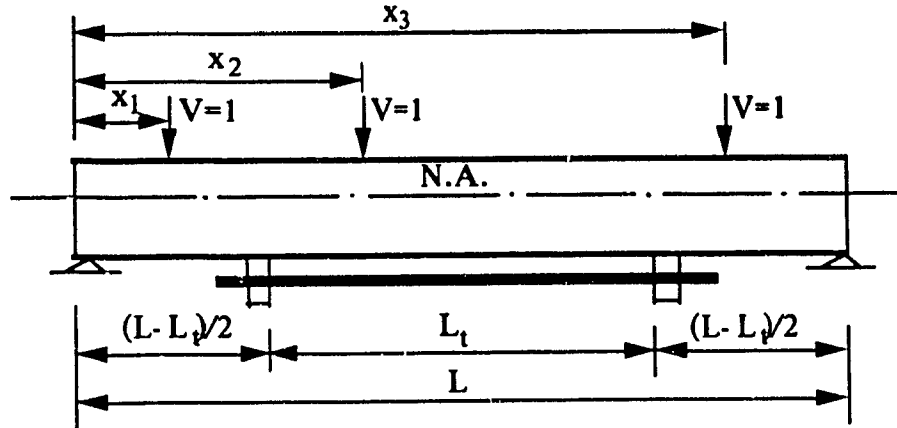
Typical girder prestressed by short tendons, subjected to an arbitrary unit load.
